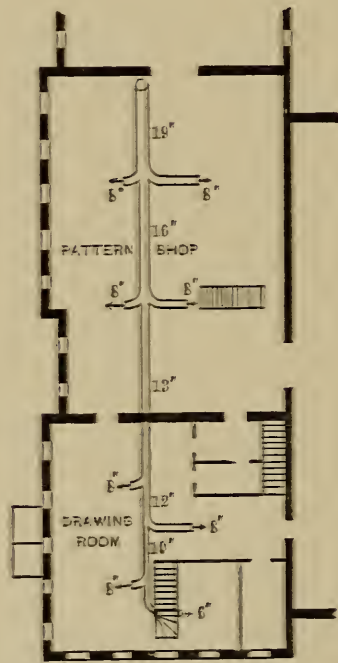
Plan of Heating System for Office Building. Second Floor.
